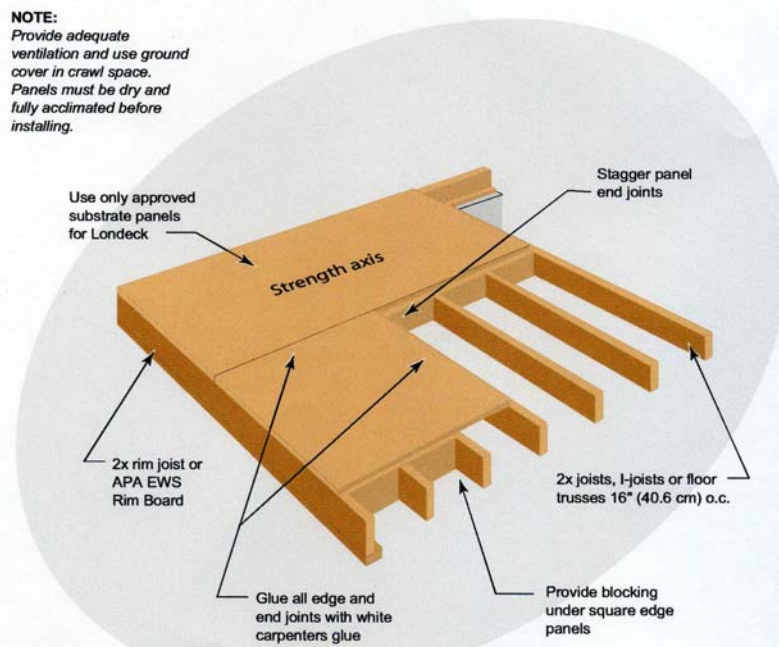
APA Rated Sturd-I-Floor 16" (406.cm) O.C.
